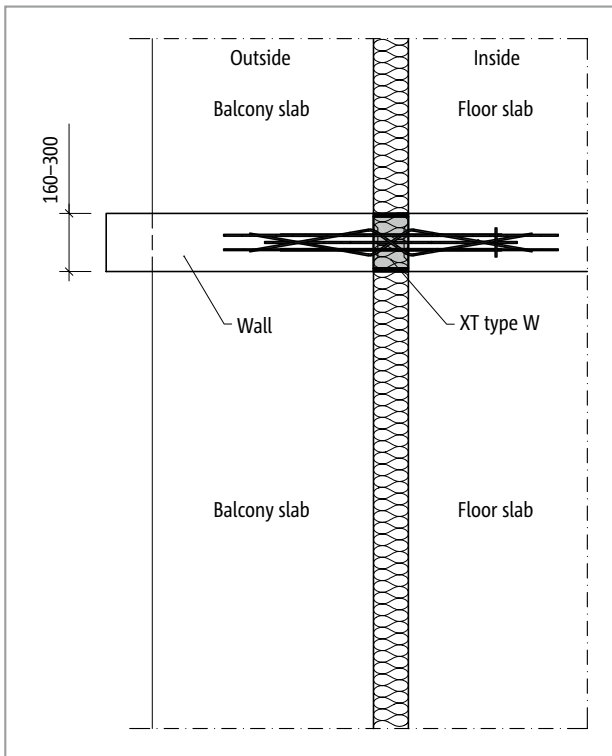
Schöck Isokorb® XT type W: Plan view; balcony construction with thermally insulated load-bearing shear walls
